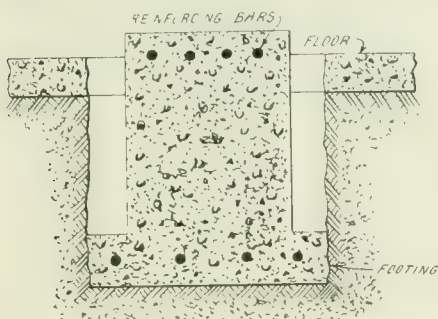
TRANSVERSE SECTION OF A PLANER FOUNDATION SHOWING STEEL REINFORCING RODS
